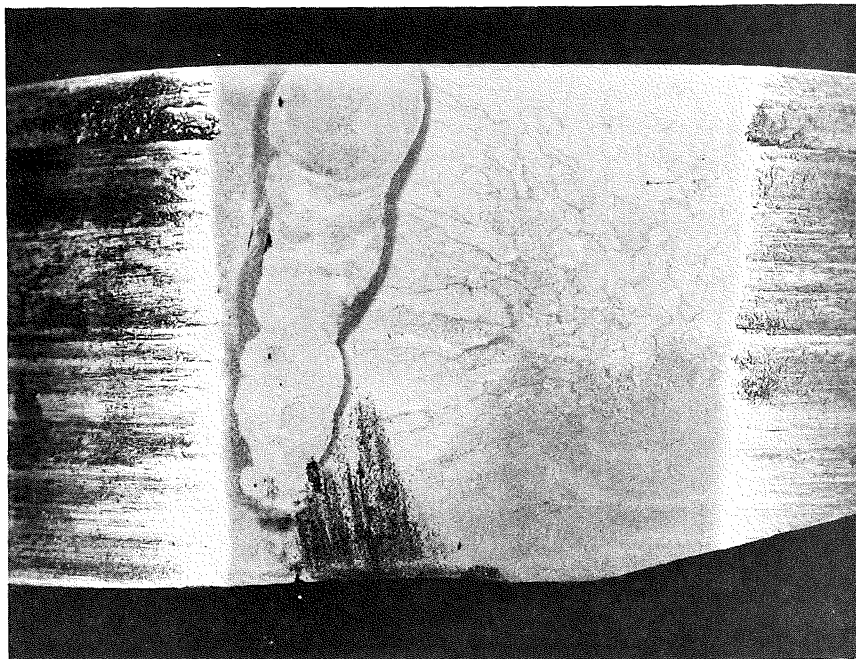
Side view of core from northbound girder G4 W2A showing repair weld.
